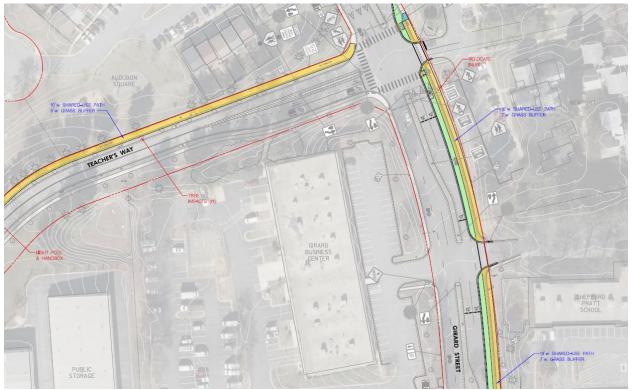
Concept 3, Teachers Way to Girard Street SUP
